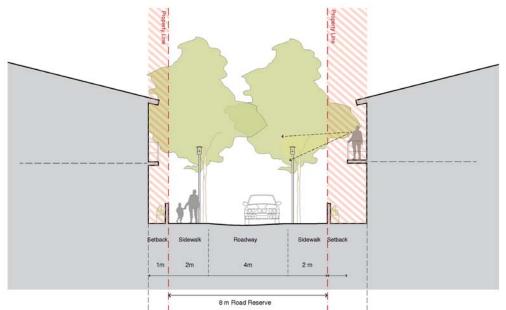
A street section illustrating a typical neighbourhood street, with visible exteriors, minimum setbacks and public sidewalks to encourage pedestrian movement.
